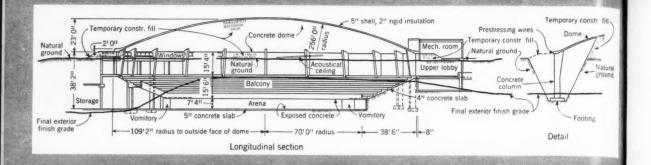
Albuquerque Civic Auditorium will seat 3,500 in balcony of arena-type structure. Shell dome will be cast on temporary fill, which will be excavated after outer ring of shell has been post-stressed by winding with high-tension wire. Detail section shows column and footing arrangement.
